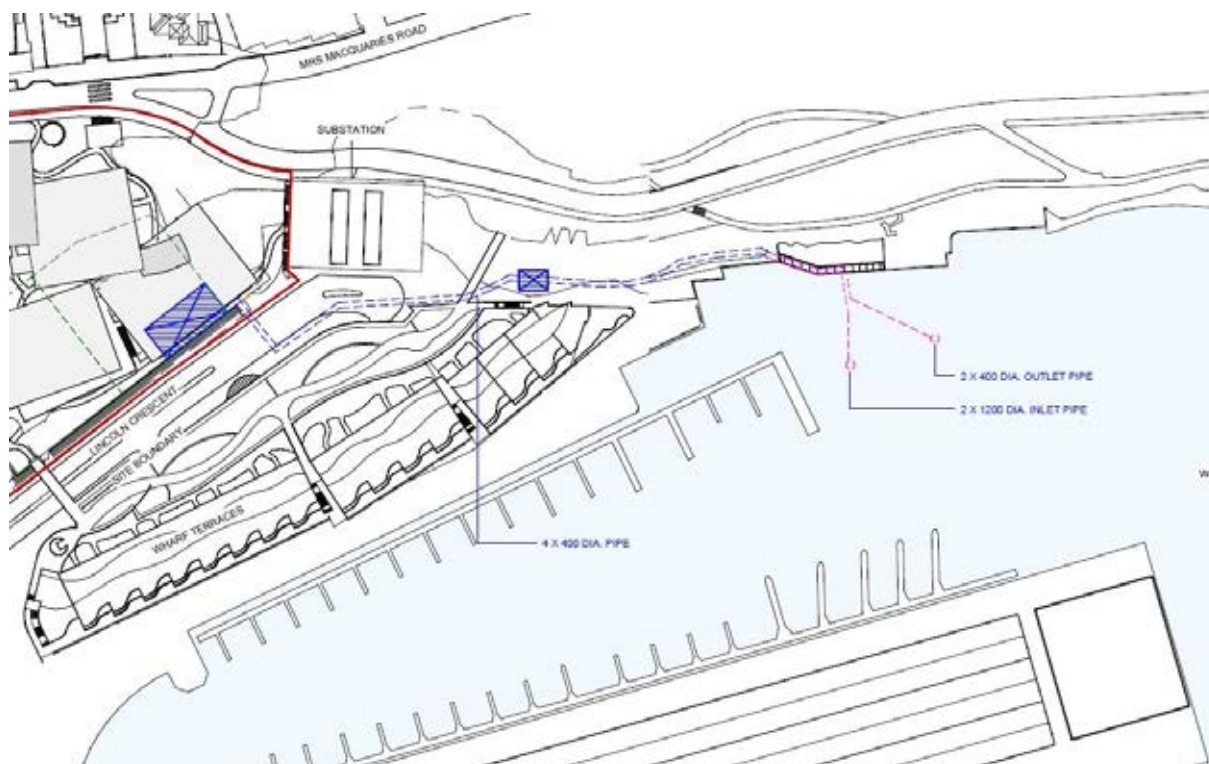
Detail of the OVA Sea Water Heat Exchange System Plan showing the proposed route of the seawater heat exchange pipework and underground plant room. (Source: Architectus, OVA-ARCH-D-00026, Revision B, June 2016)
